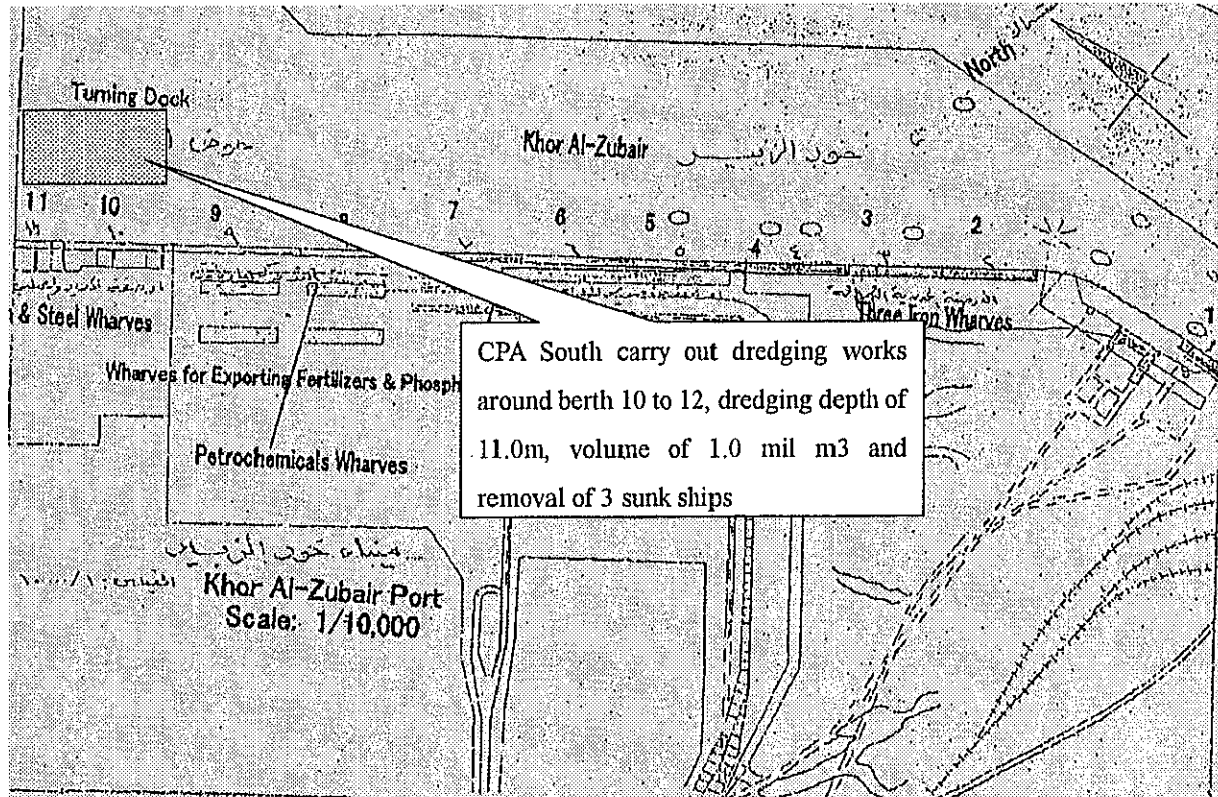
(5) Khor Al Zubair Port General Plan
